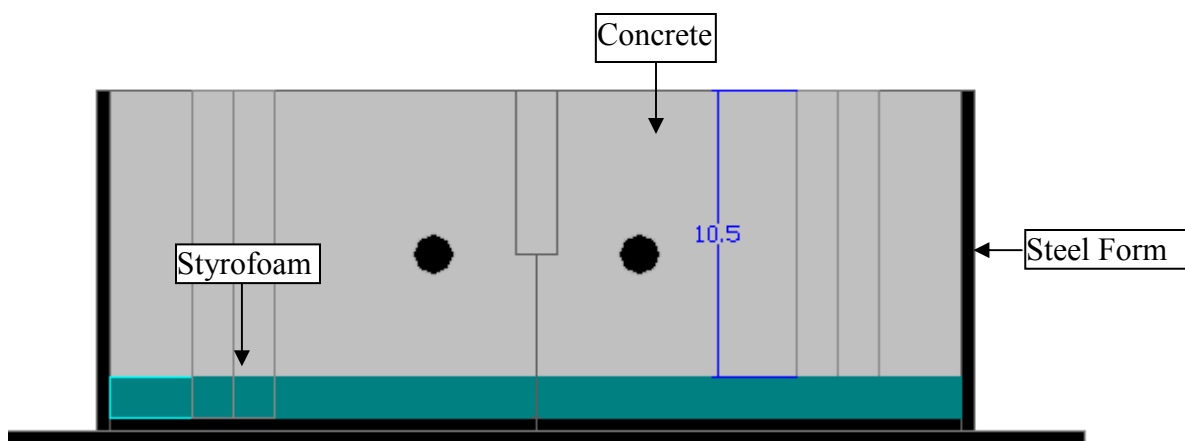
Original tensile wedge apparatus dimensions - front view without wedge
